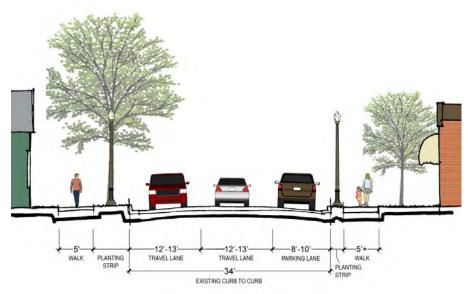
Recommended streetscape cross-section for segments of Main Street with existing curb-to-curb width of 34 ft or more.
